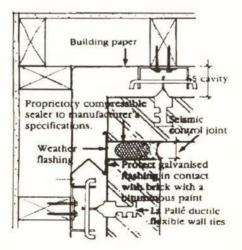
Re-entrant corner detail from Brickmakers Ltd Design Note 1A (June 1989).
